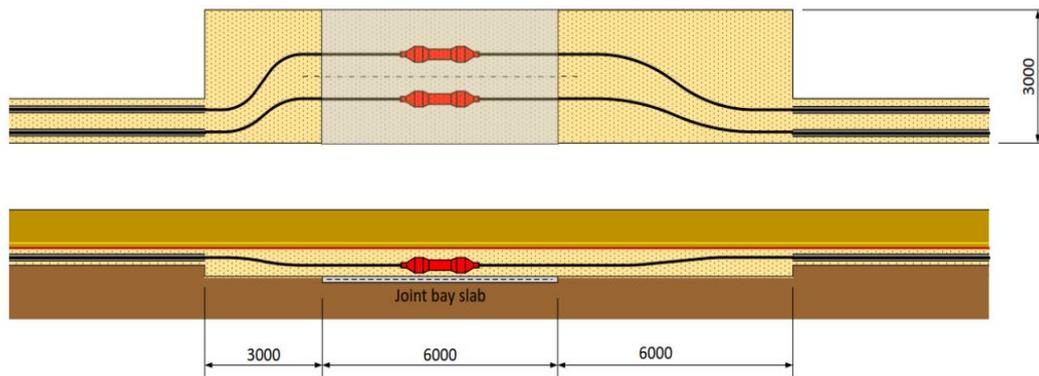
Typical Joint-Bay Dimensions (source: WSP | not to scale)
